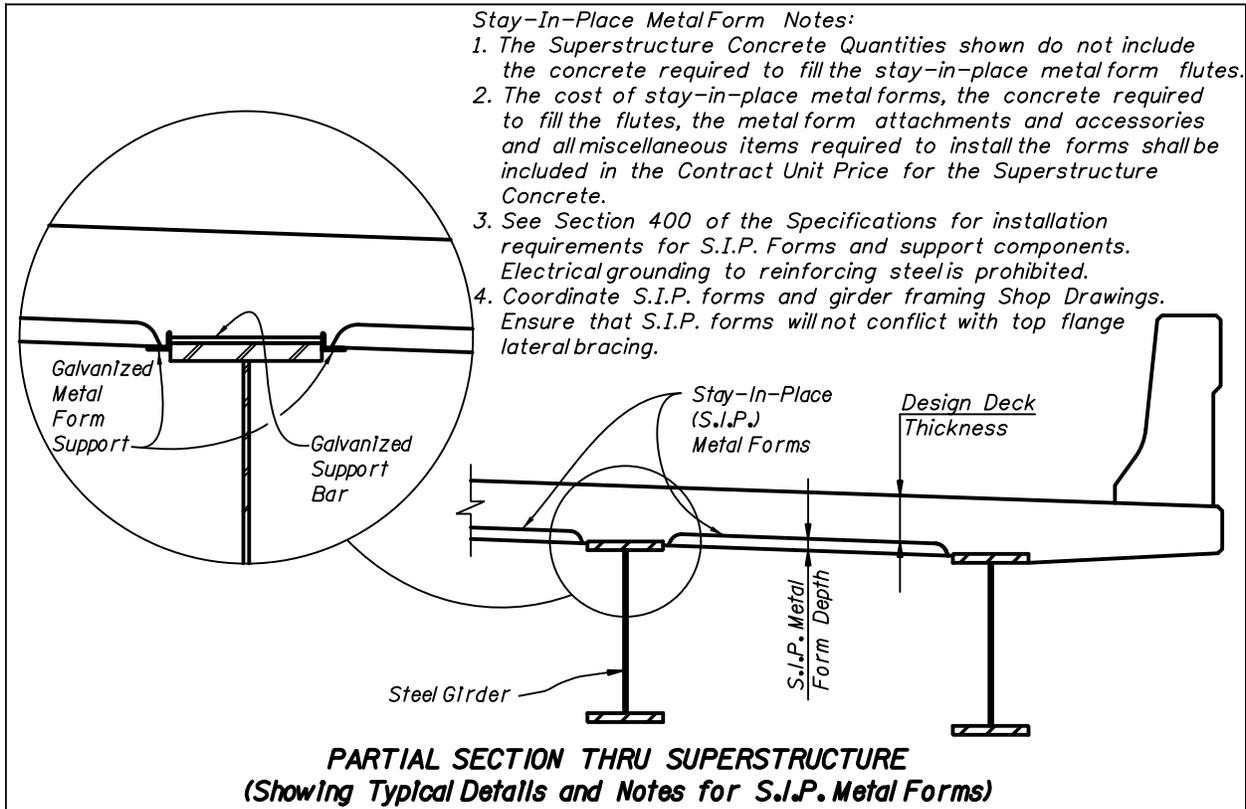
S.I.P. Form Details for Steel I-Girders (End Detail)
